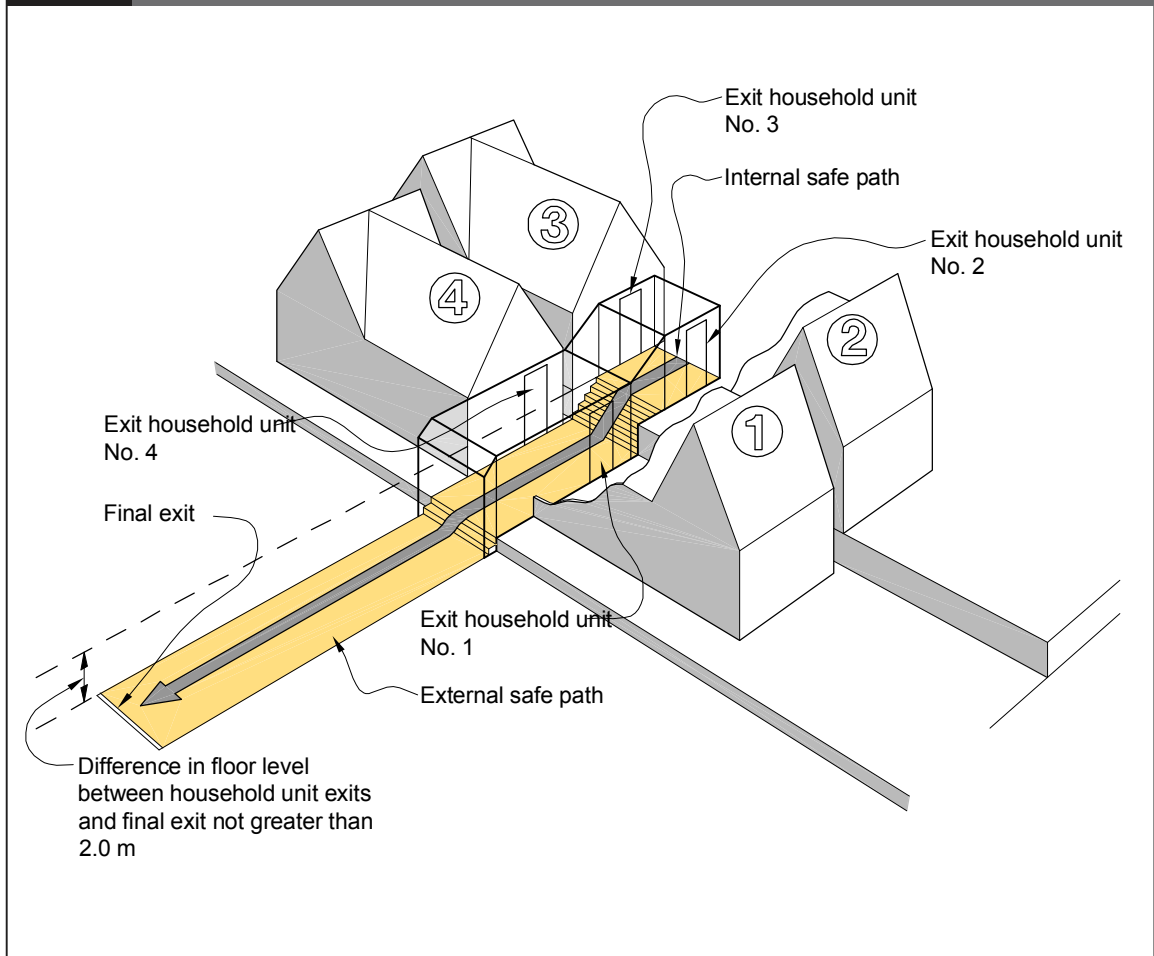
Single Escape Routes – Direct Access to Balcony and Stairway
